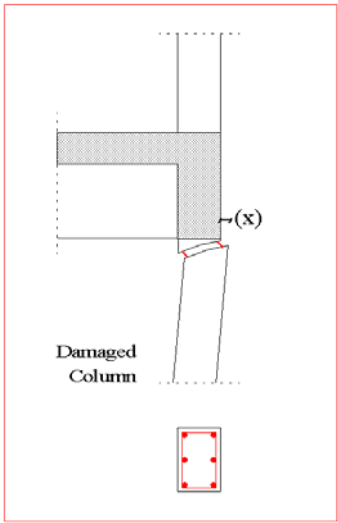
KB-cyclic test: details of the damaged external columns ('shear-out')
